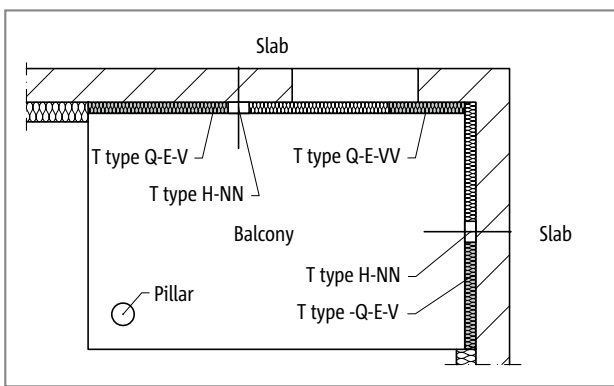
Schöck Isokorb® T type H: Balcony supported on two sides with pillar
